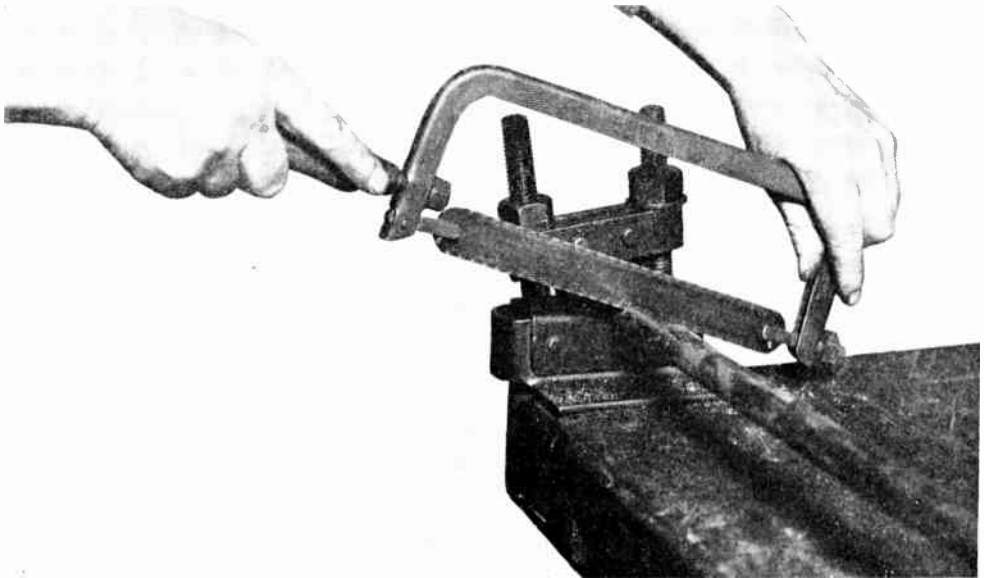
HOW TO CUT STEEL CONDUIT.
